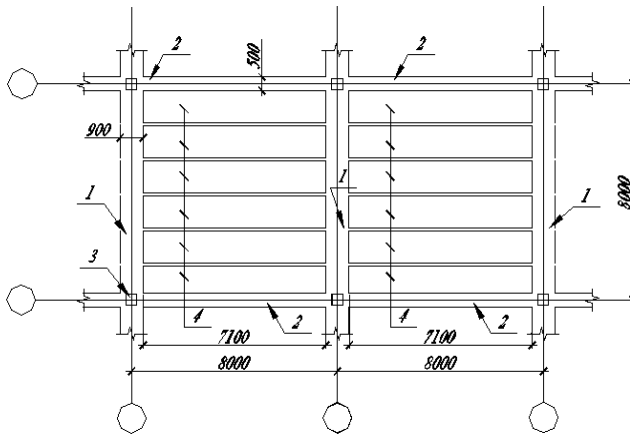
Construction of precast and cast-in-situ frame of the building with a flat precast and cast-in-situ slabs PGASA: 1 – bearing crossbars, 2 – braced crossbars, 3 - concrete columns; 4 - hollow-core slabs;
